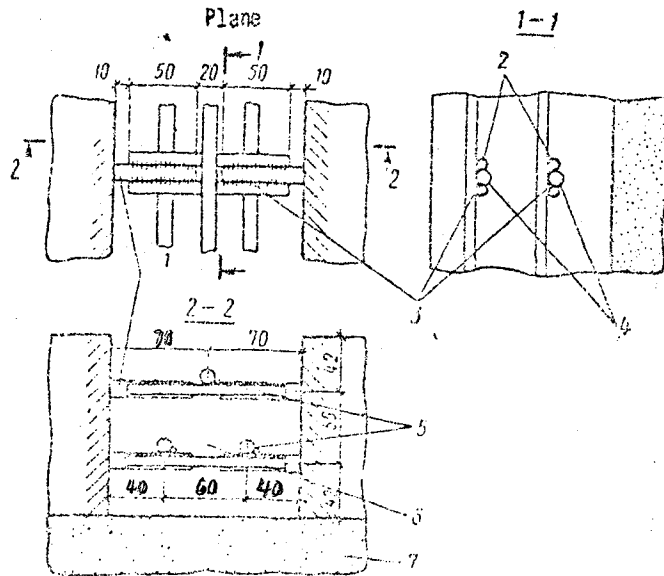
CONNECTION OF THE SLABS ACCORDING TO THE TYPE OF "REINFORCING BEAM"
